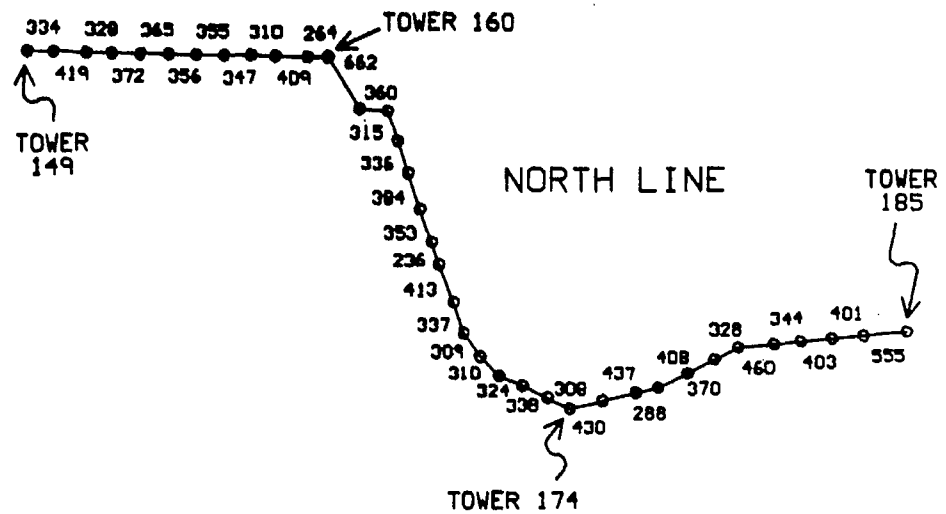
Plan showing the span lengths on the "as-built" north power line.
